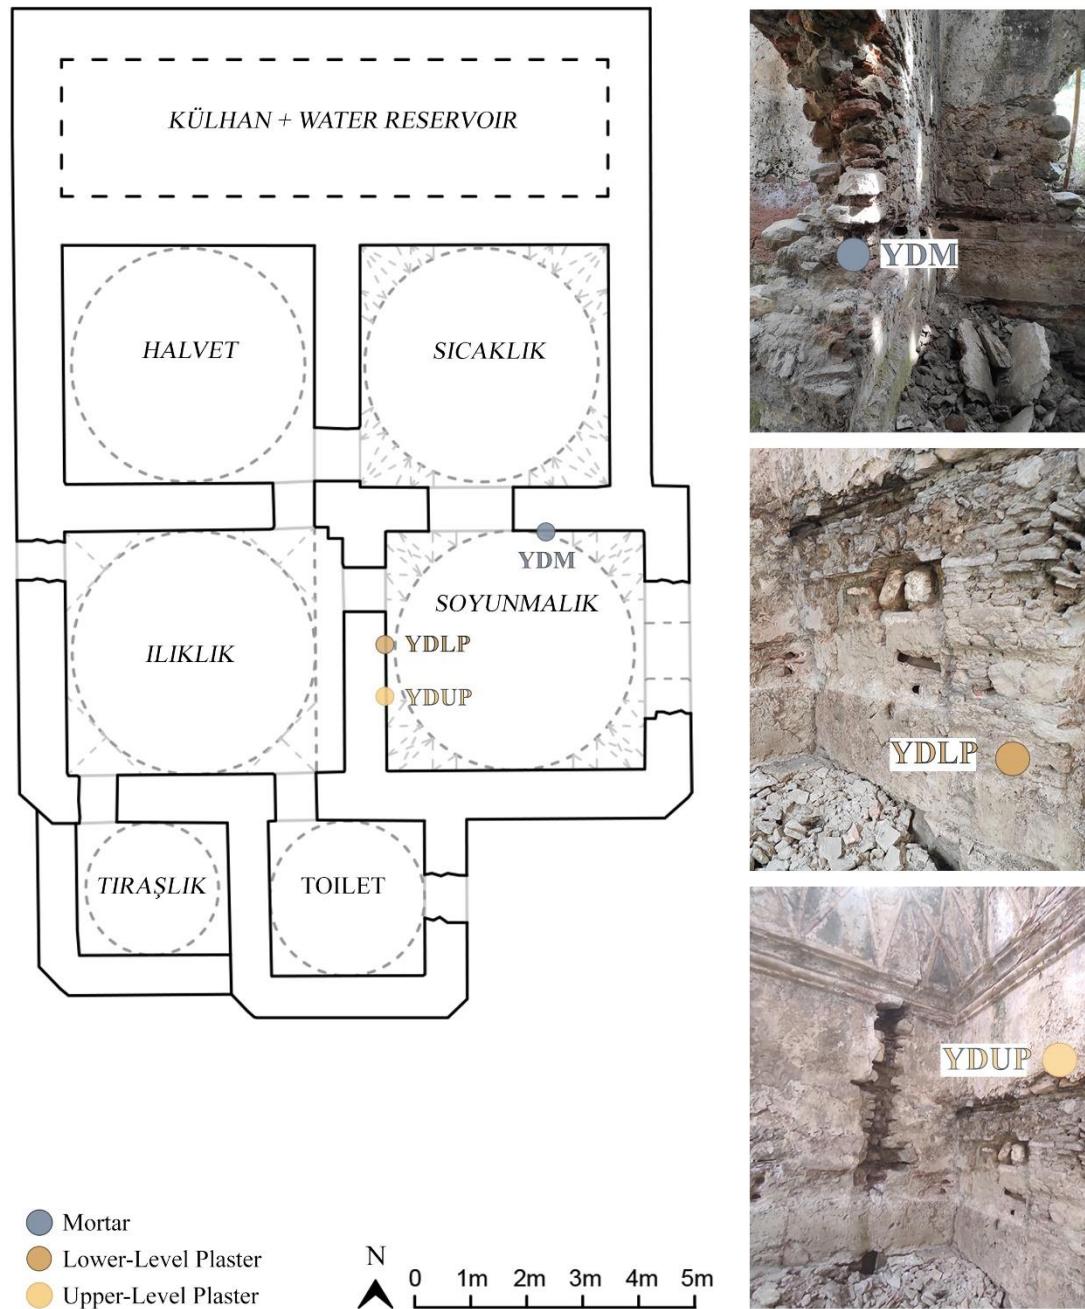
Yahsi Bey Bath Plan and collected samples' photos
